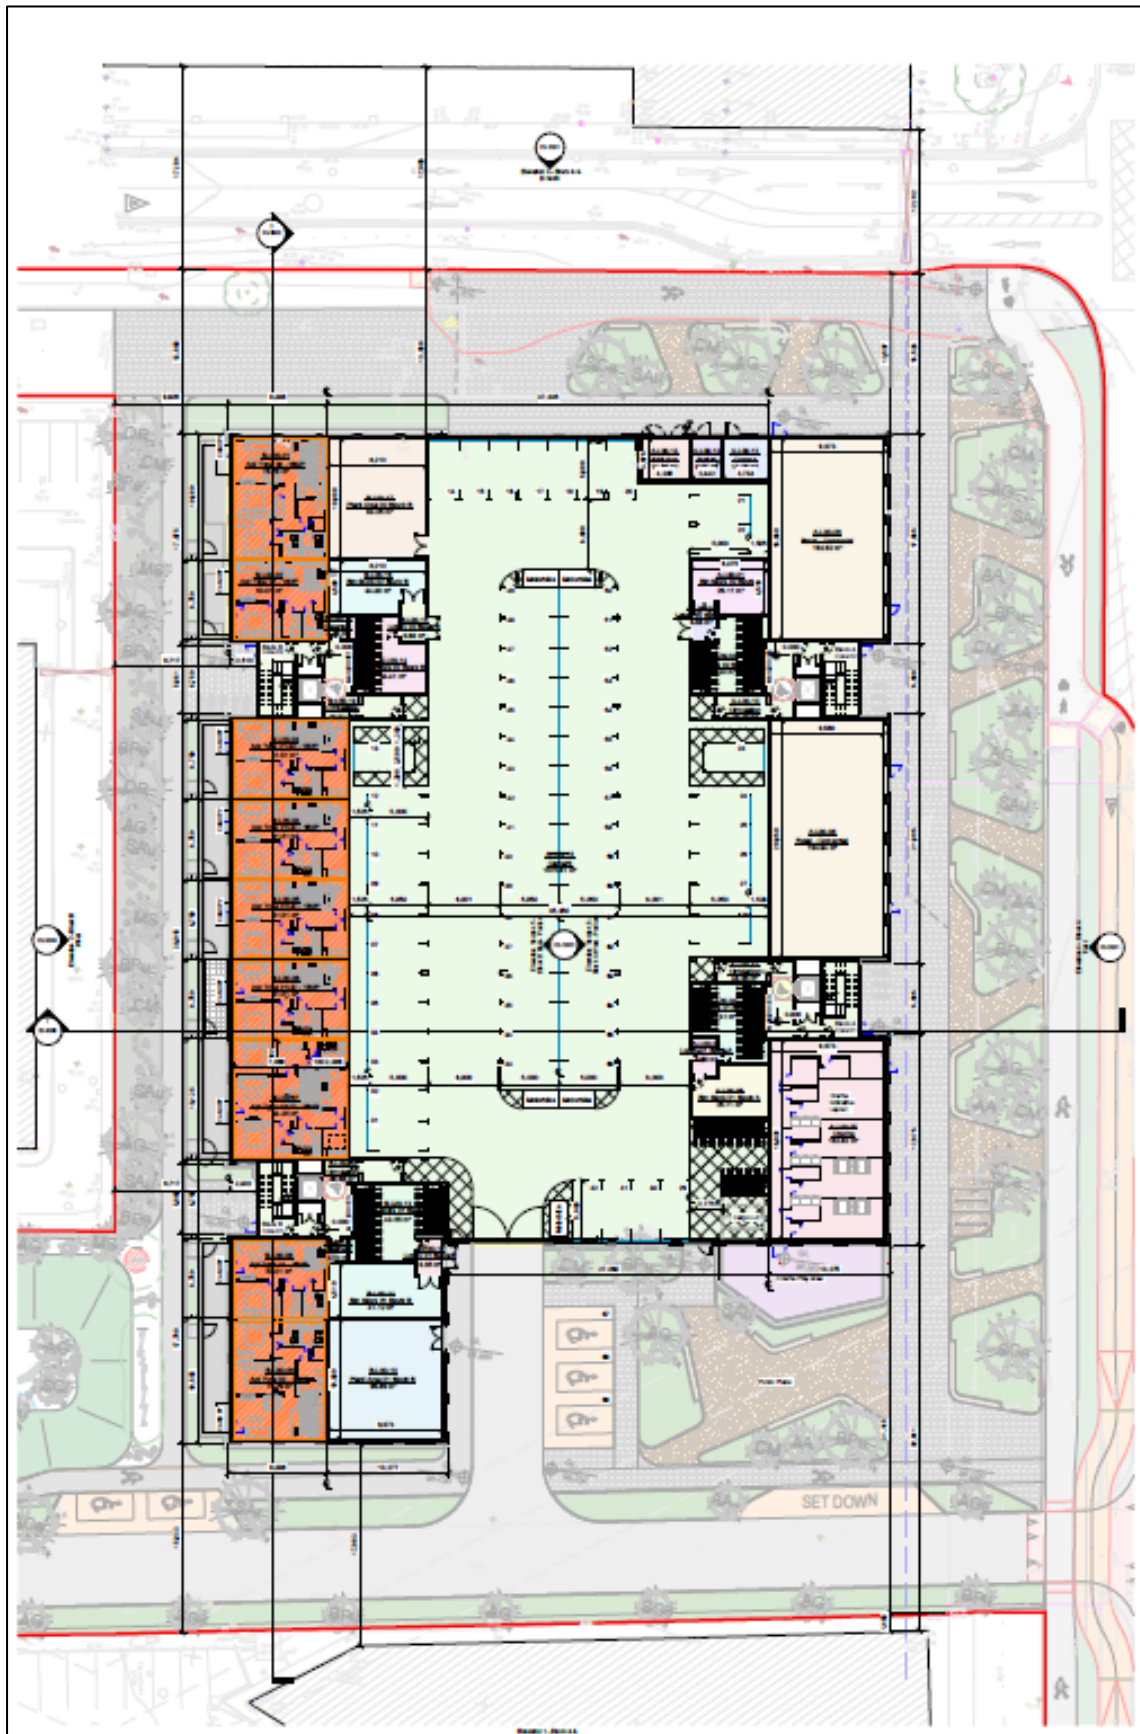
Proposed Ground floor Plan. Source: Reddy Architecture + Urbanism
